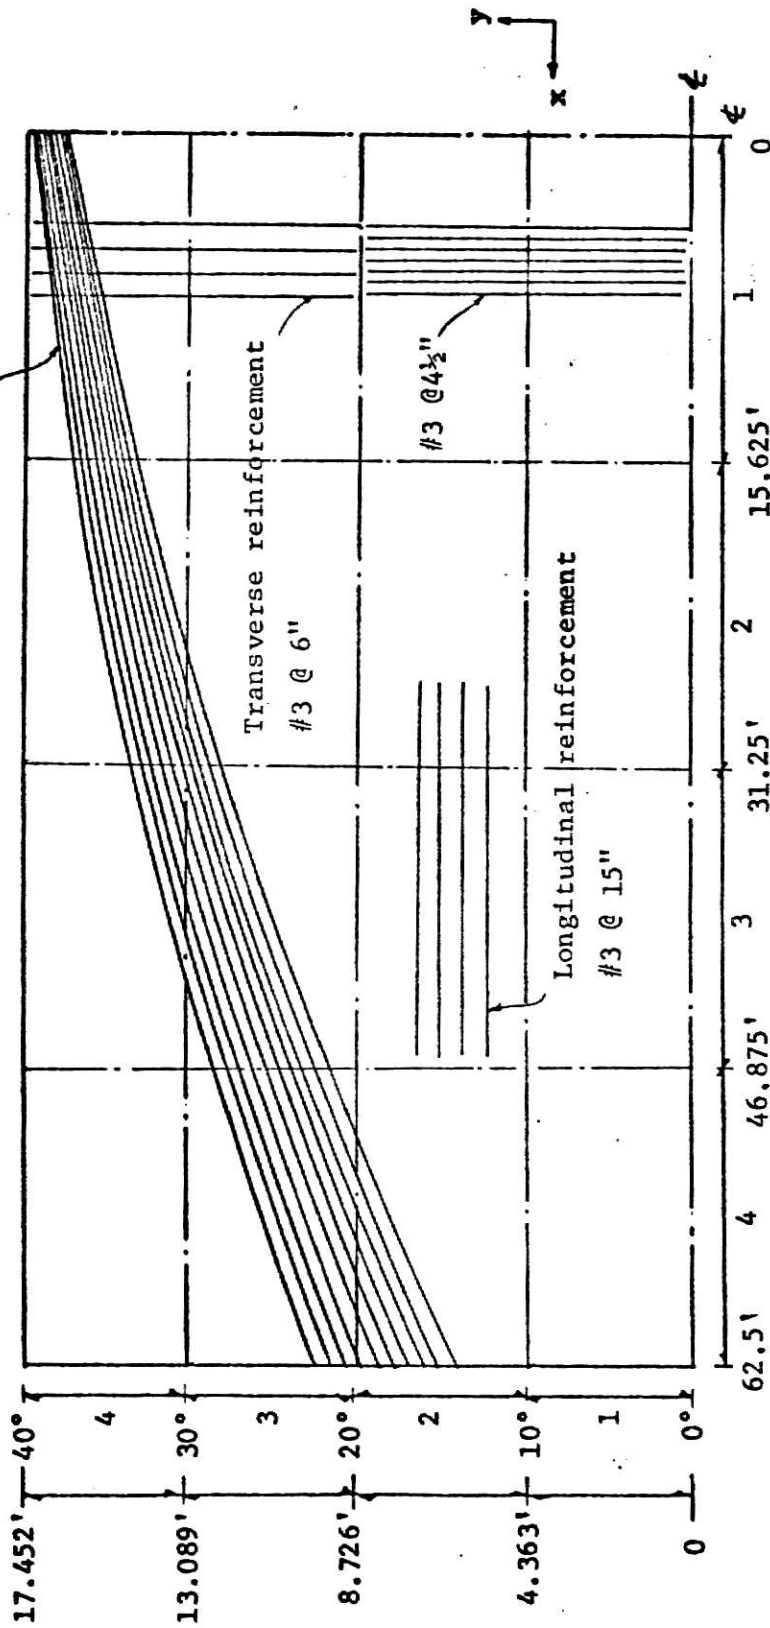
Cables and Reinforcement Placement of P/C Shell without Edge Beams
